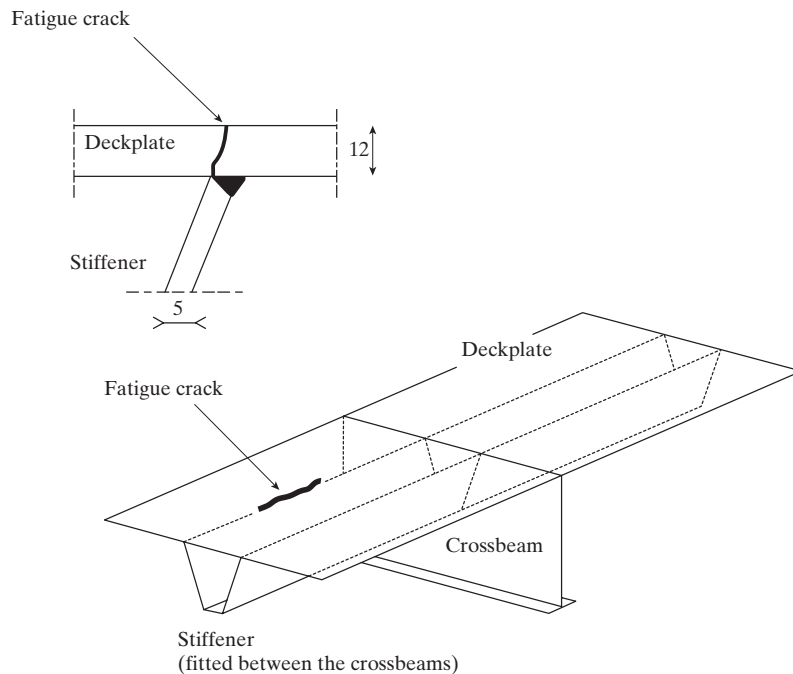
Location of the fatigue cracks (units in mm)
